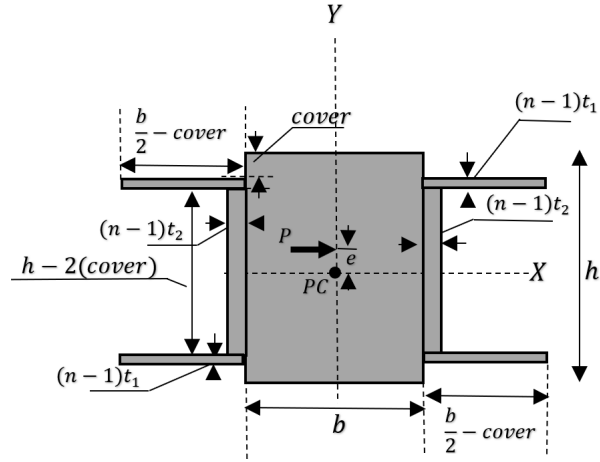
Transformed cracked cross-section mechanism with symmetric reinforcement..
